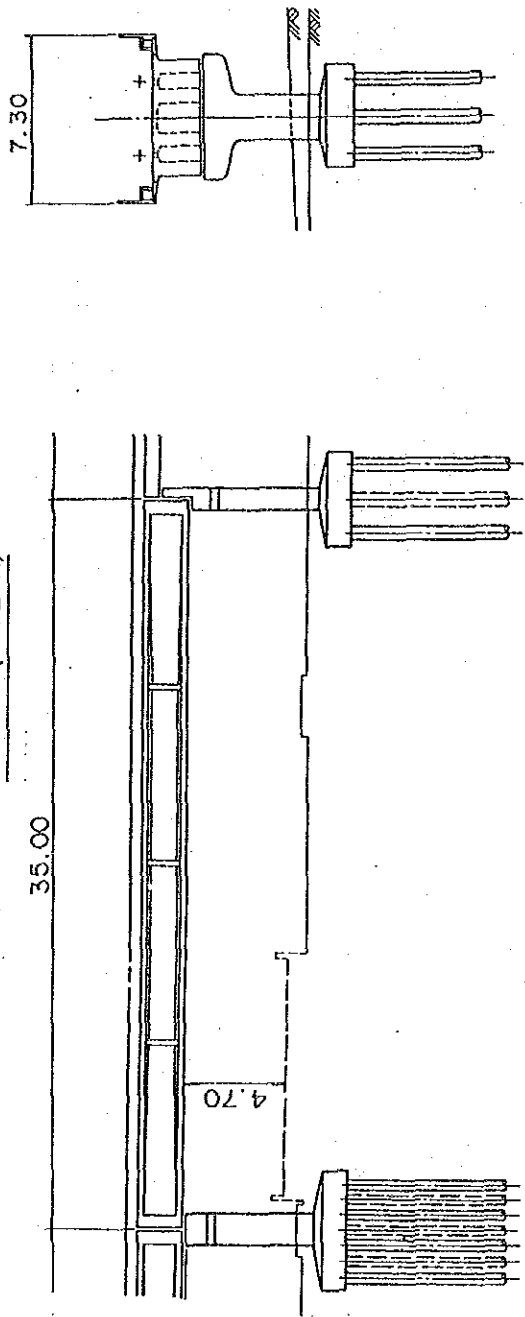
STANDARD STRUCTURE FOR ELEVATED TRACKS
